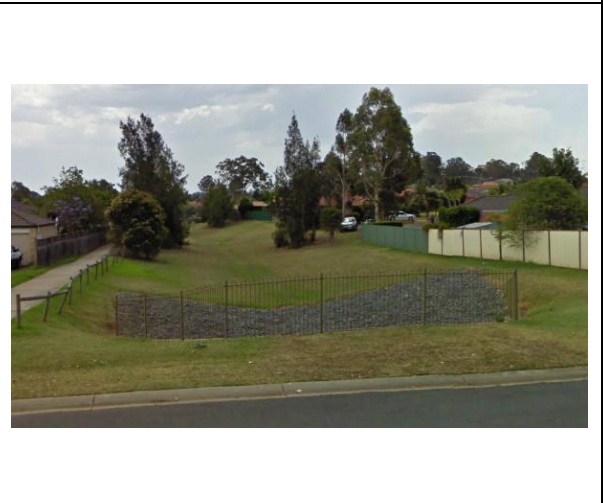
Looking south along floodway that forms main arm of Narellan Creek at outlet of 3 off 1700 RCP's at DRC 3530 (cross drainage structure X9).
